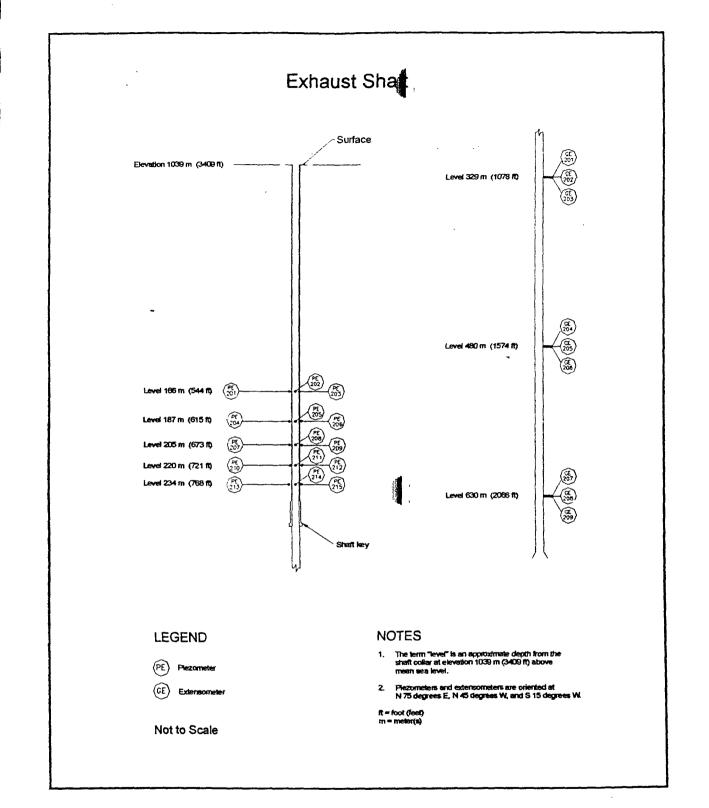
Exhaust Shaft Instrumentation (Without Shaft Key)
